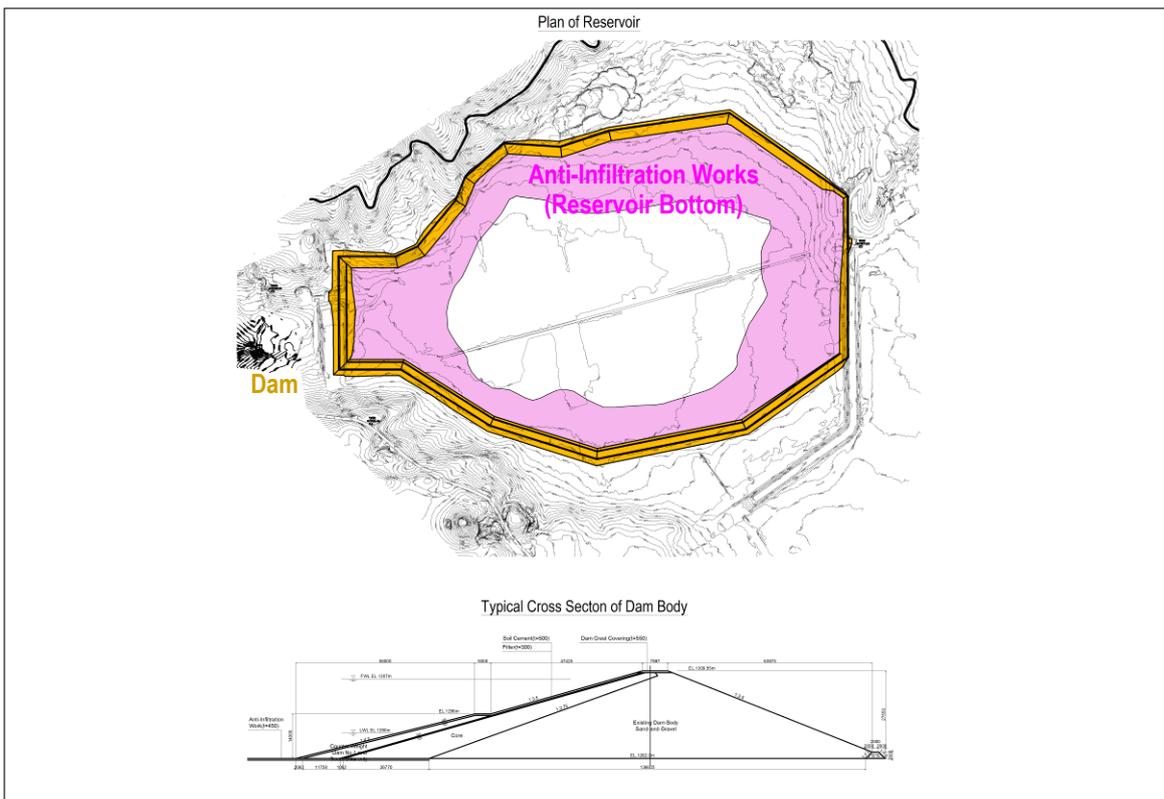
Plan and Typical Cross Section (Plan-B)
